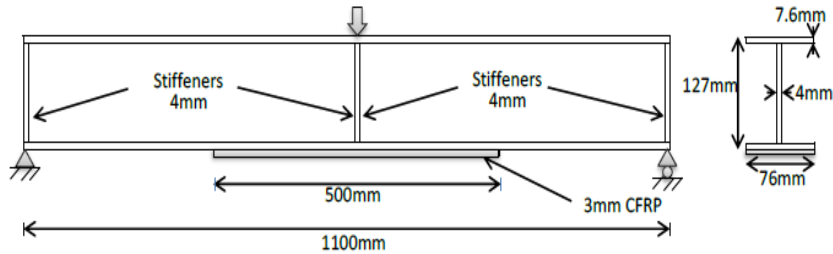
Details of steel I-beam strengthened using CFRP plate [Deng and Lee (2007)]
